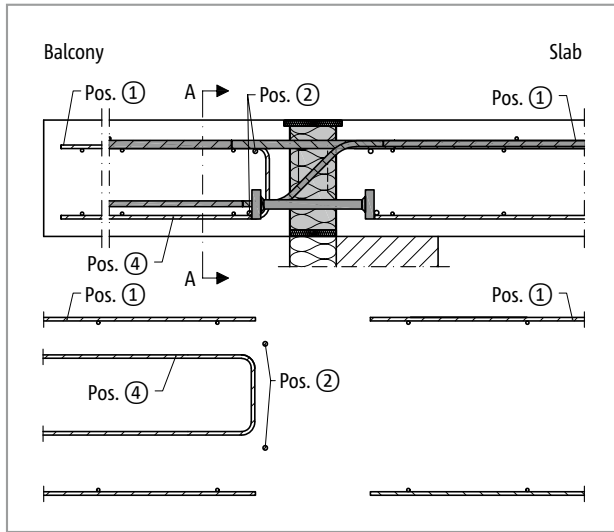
Schöck Isokorb® T type K-M12: On-site reinforcement with direct support
